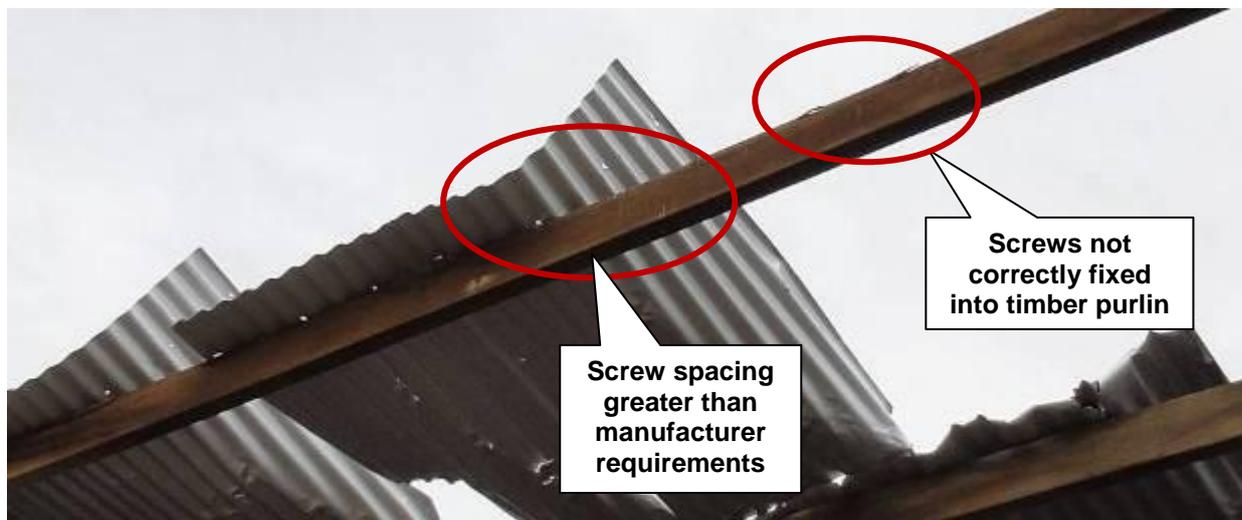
Large fastener spacings led to fatigue failures of sheeting
